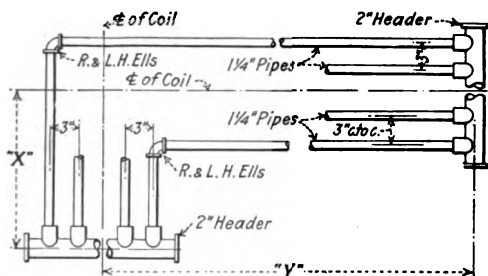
DETAIL OF CEILING PIPE COILS.
